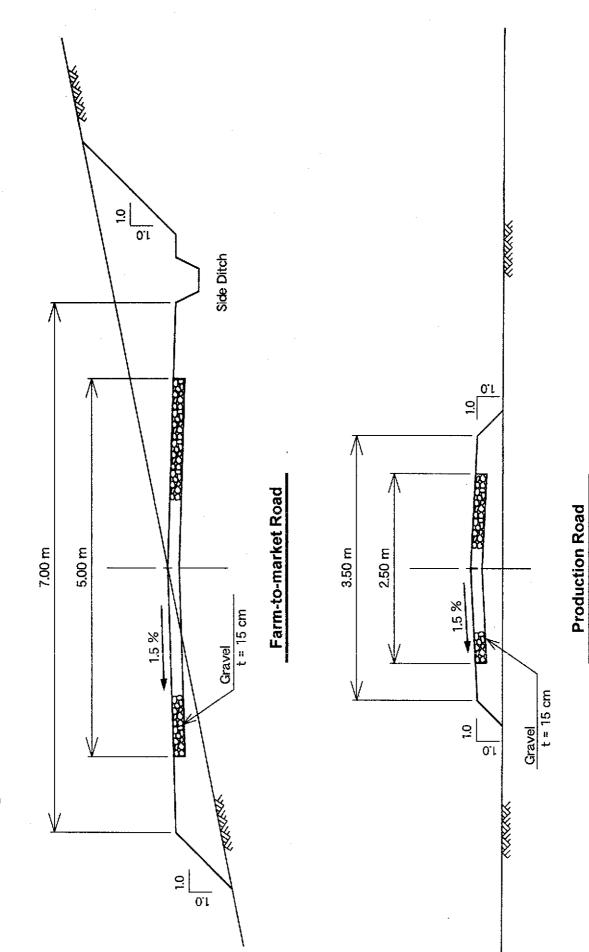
STANDARD DRAWING OF FARM-TO-MARKET ROAD
